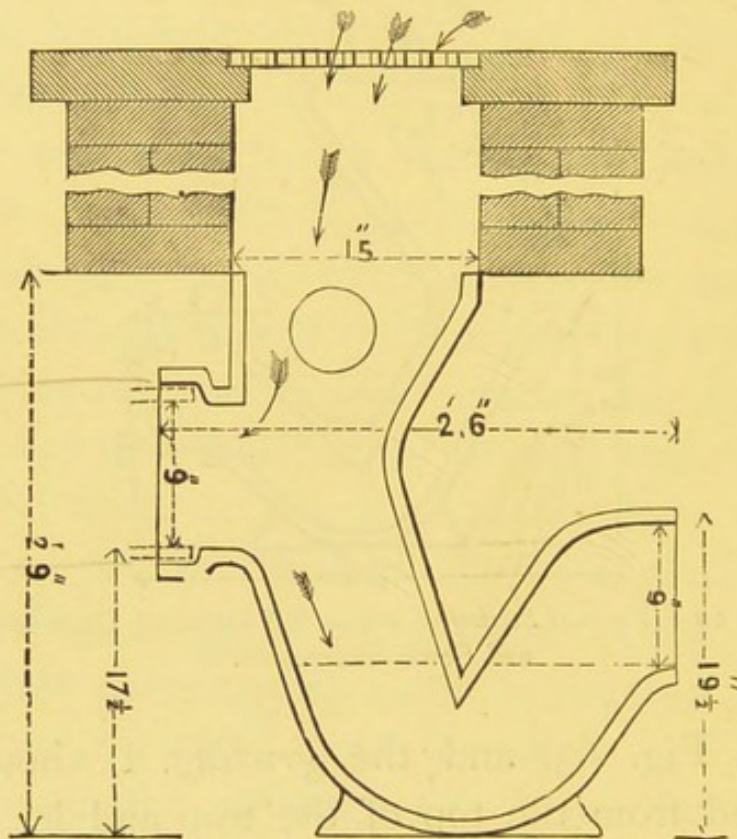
Vertical Section of a 9-in. "Ventilating Drain-syphon," &c., showing Manhole.
